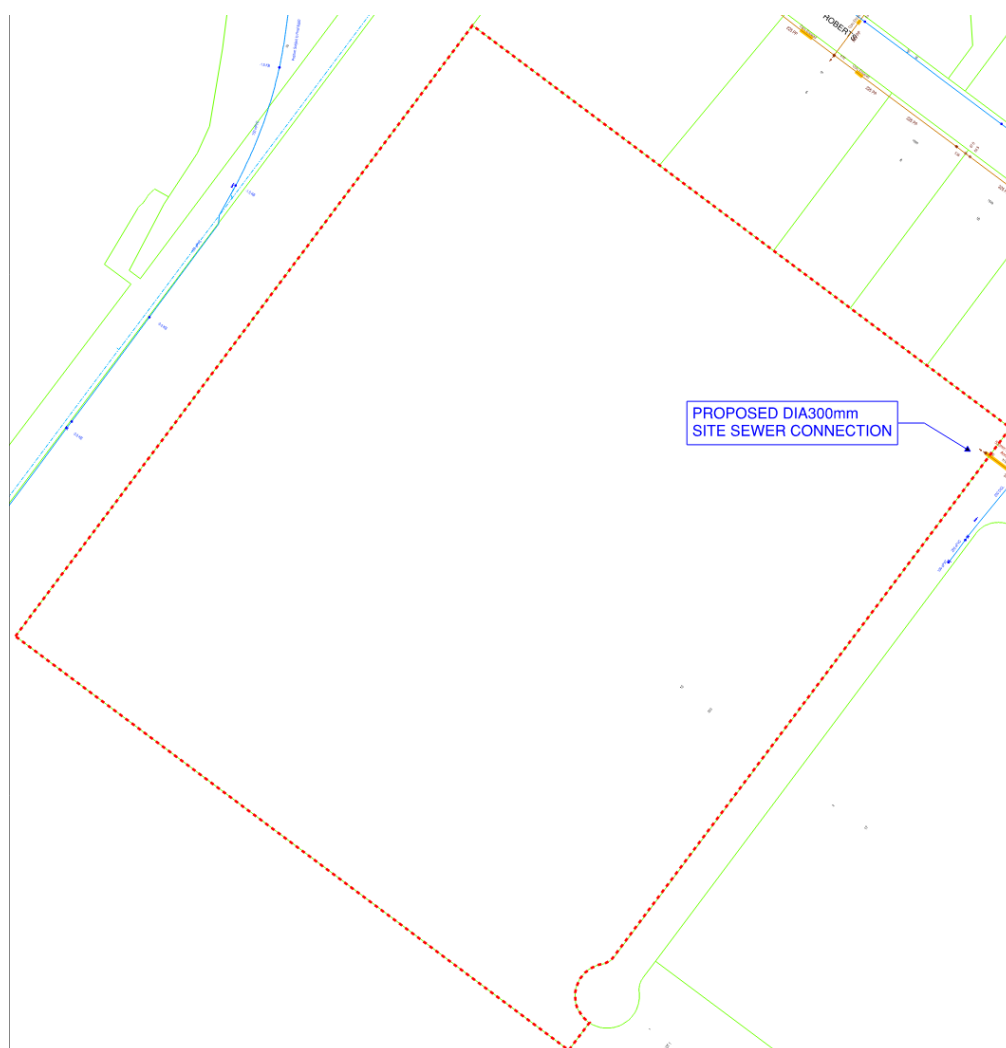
Proposed Sewer Connection to Sydney Water Asset
